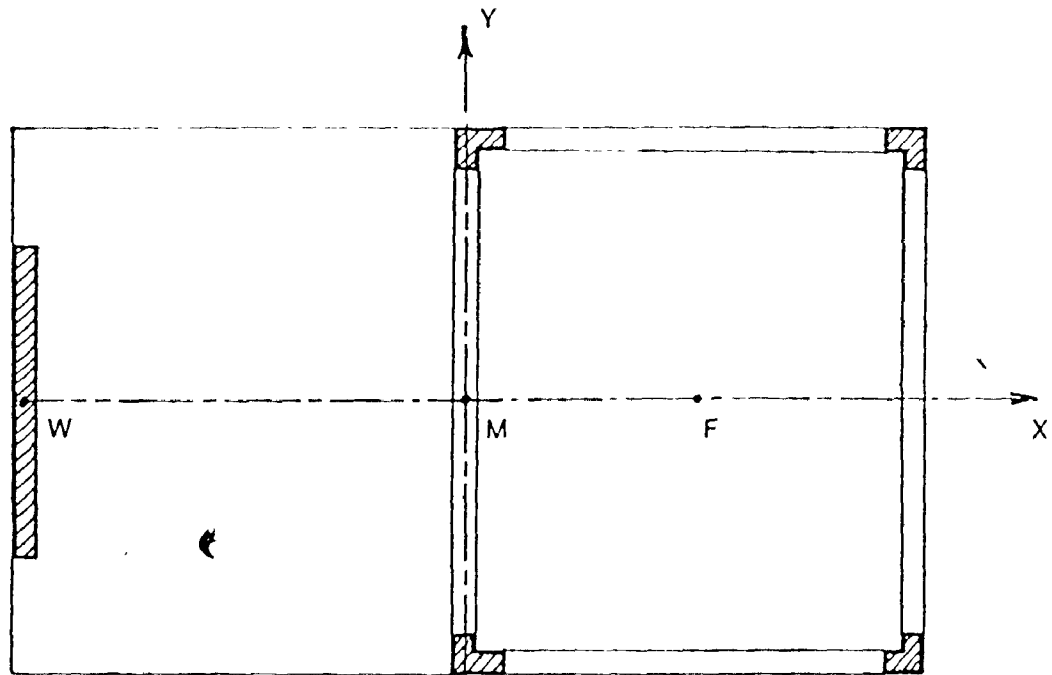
COORDINATE SYSTEM FOR A TYPICAL CROSS-SECTION OF A SINGLE WALL-FRAME SYSTEM
